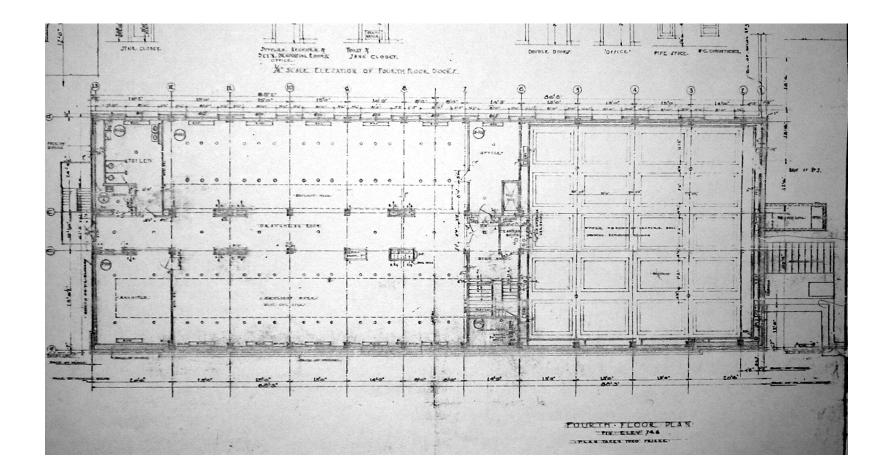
Photo of the Fourth Floor Plan of the Pratt School of Naval Architecture.
